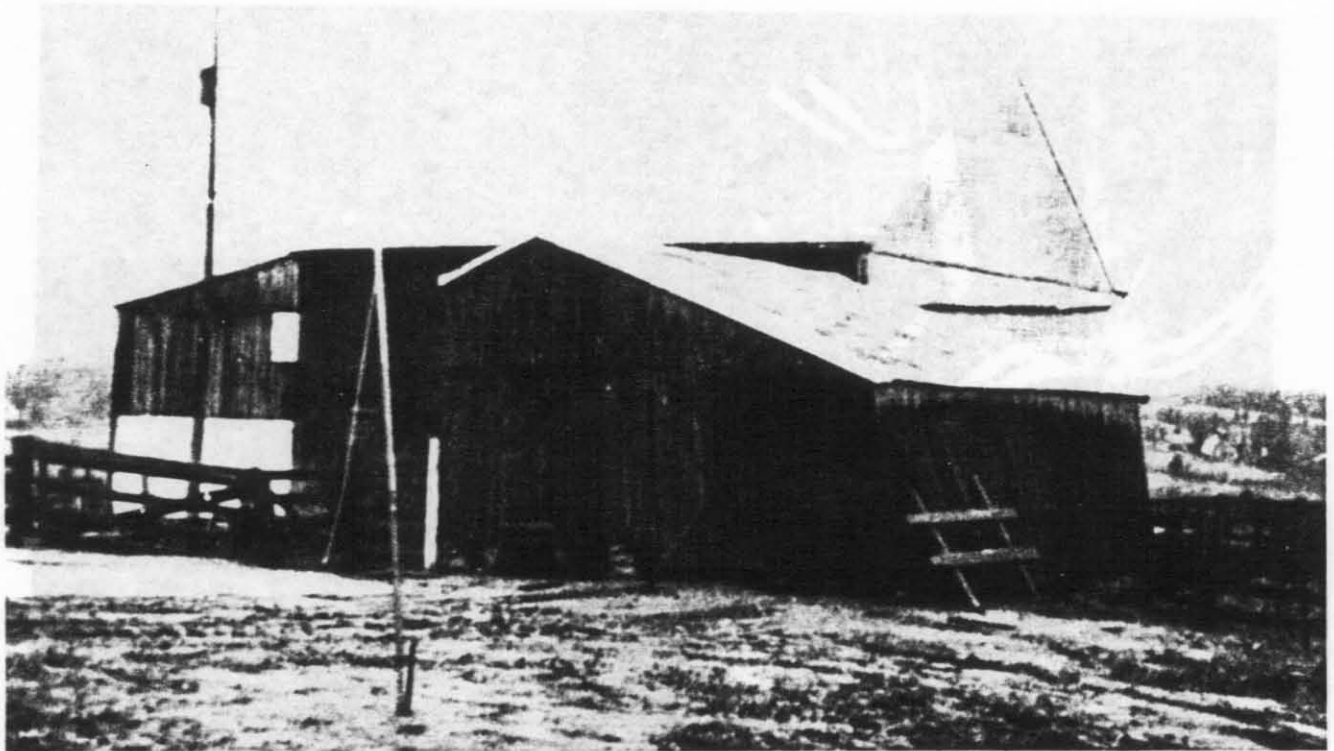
Damage to Boland farm building, about 2,000 feet south of center of blast.
